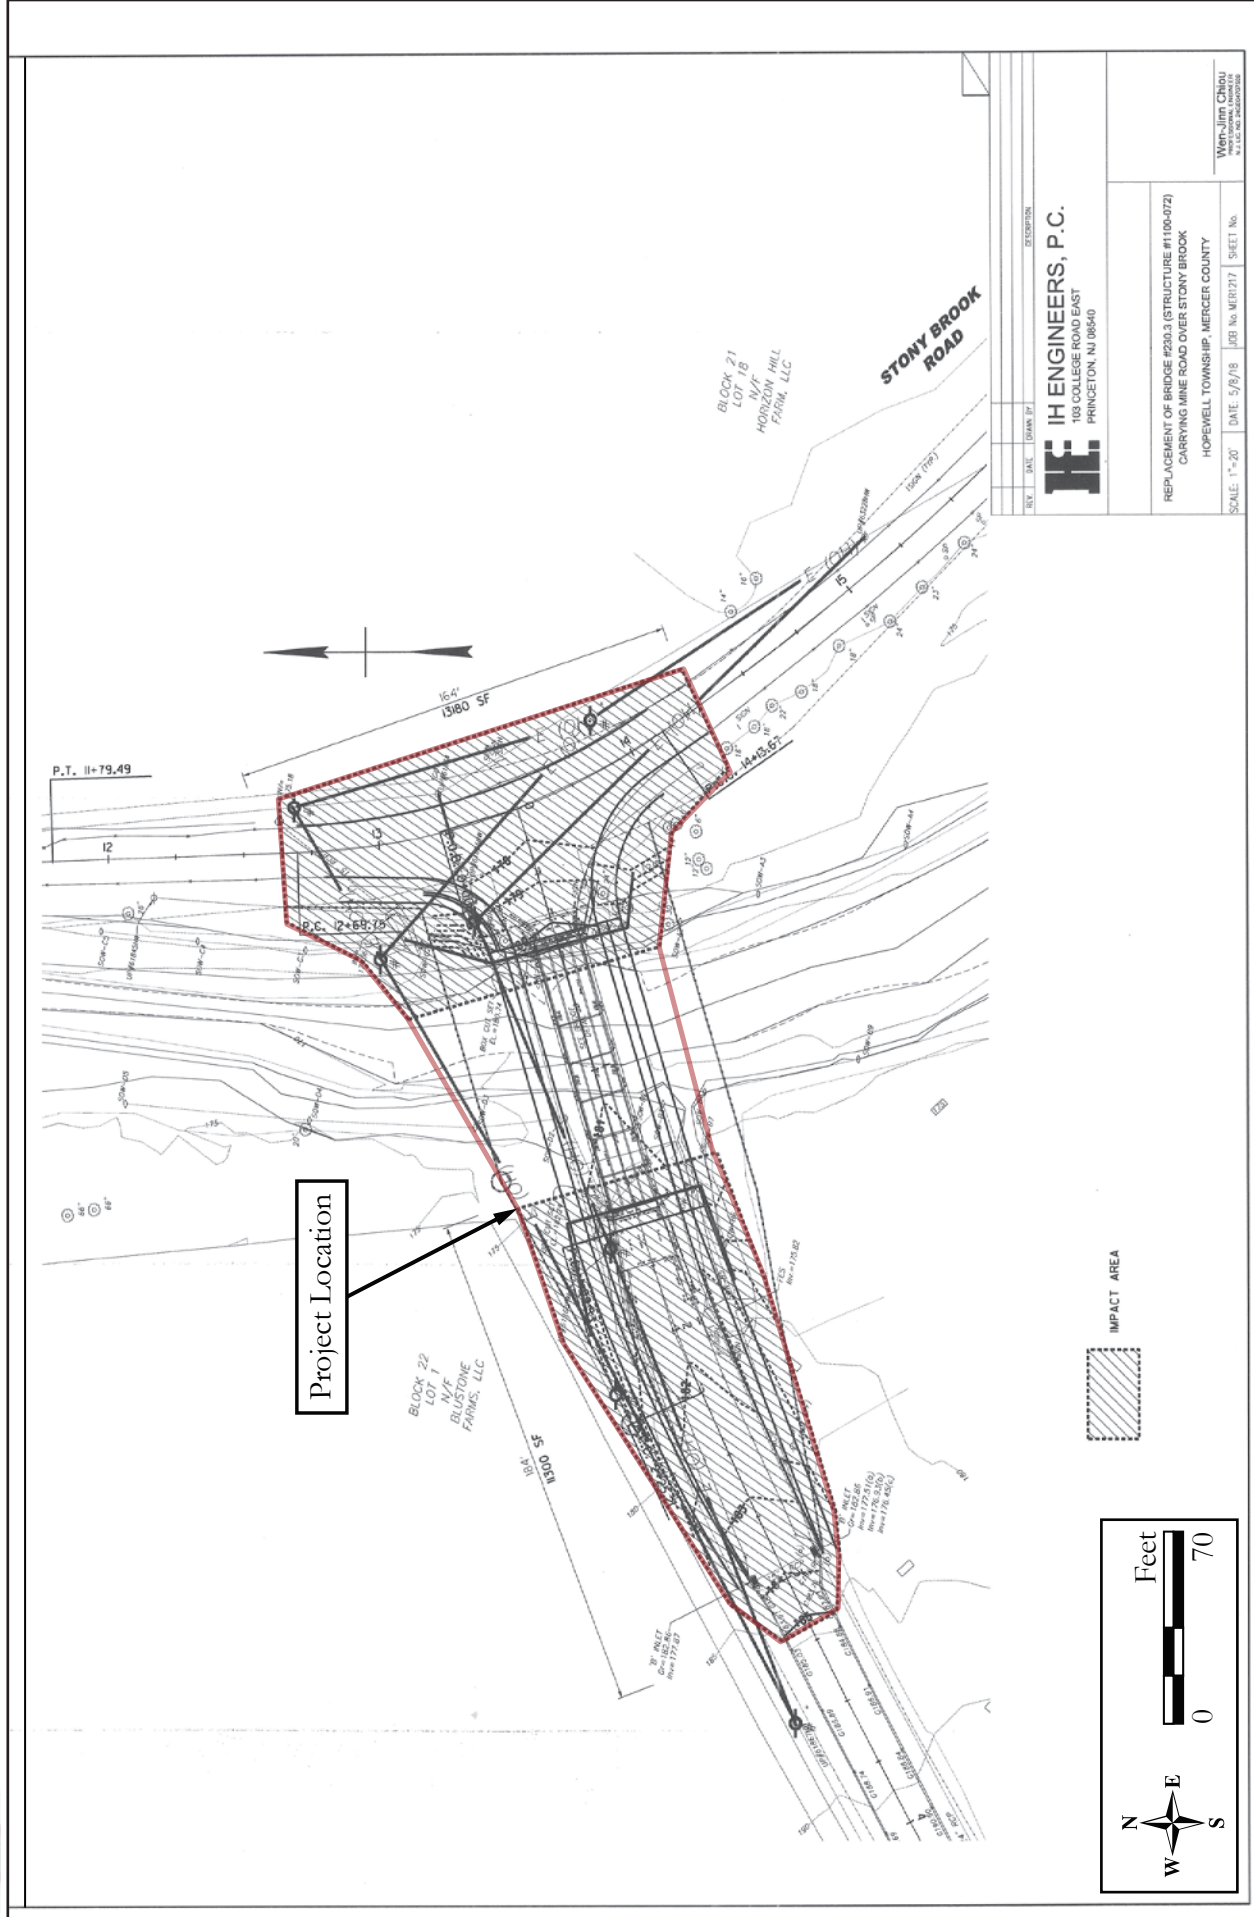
Preliminary construction plan showing the proposed impact area (from IH Engineers, P.C. 2018).
